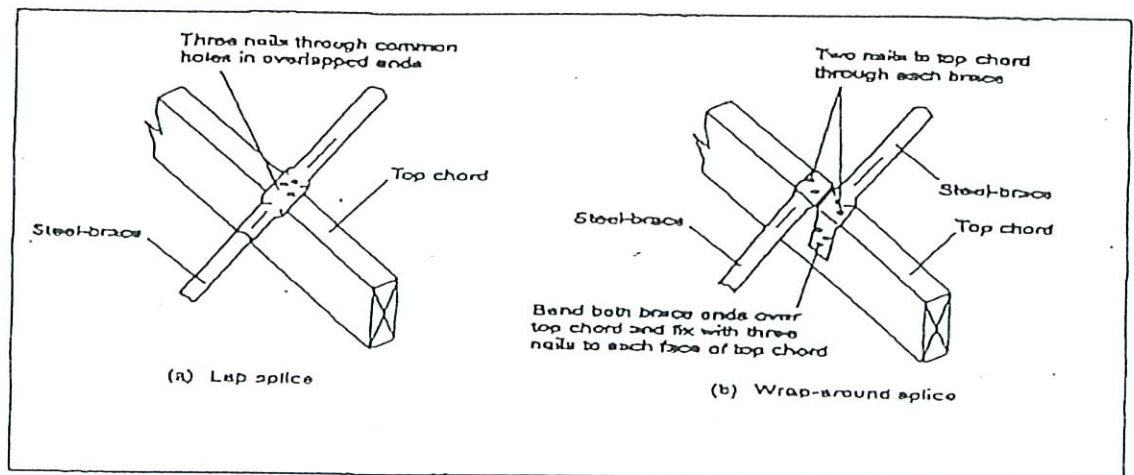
Typical Spliced Detail of Steel Strap Brace
